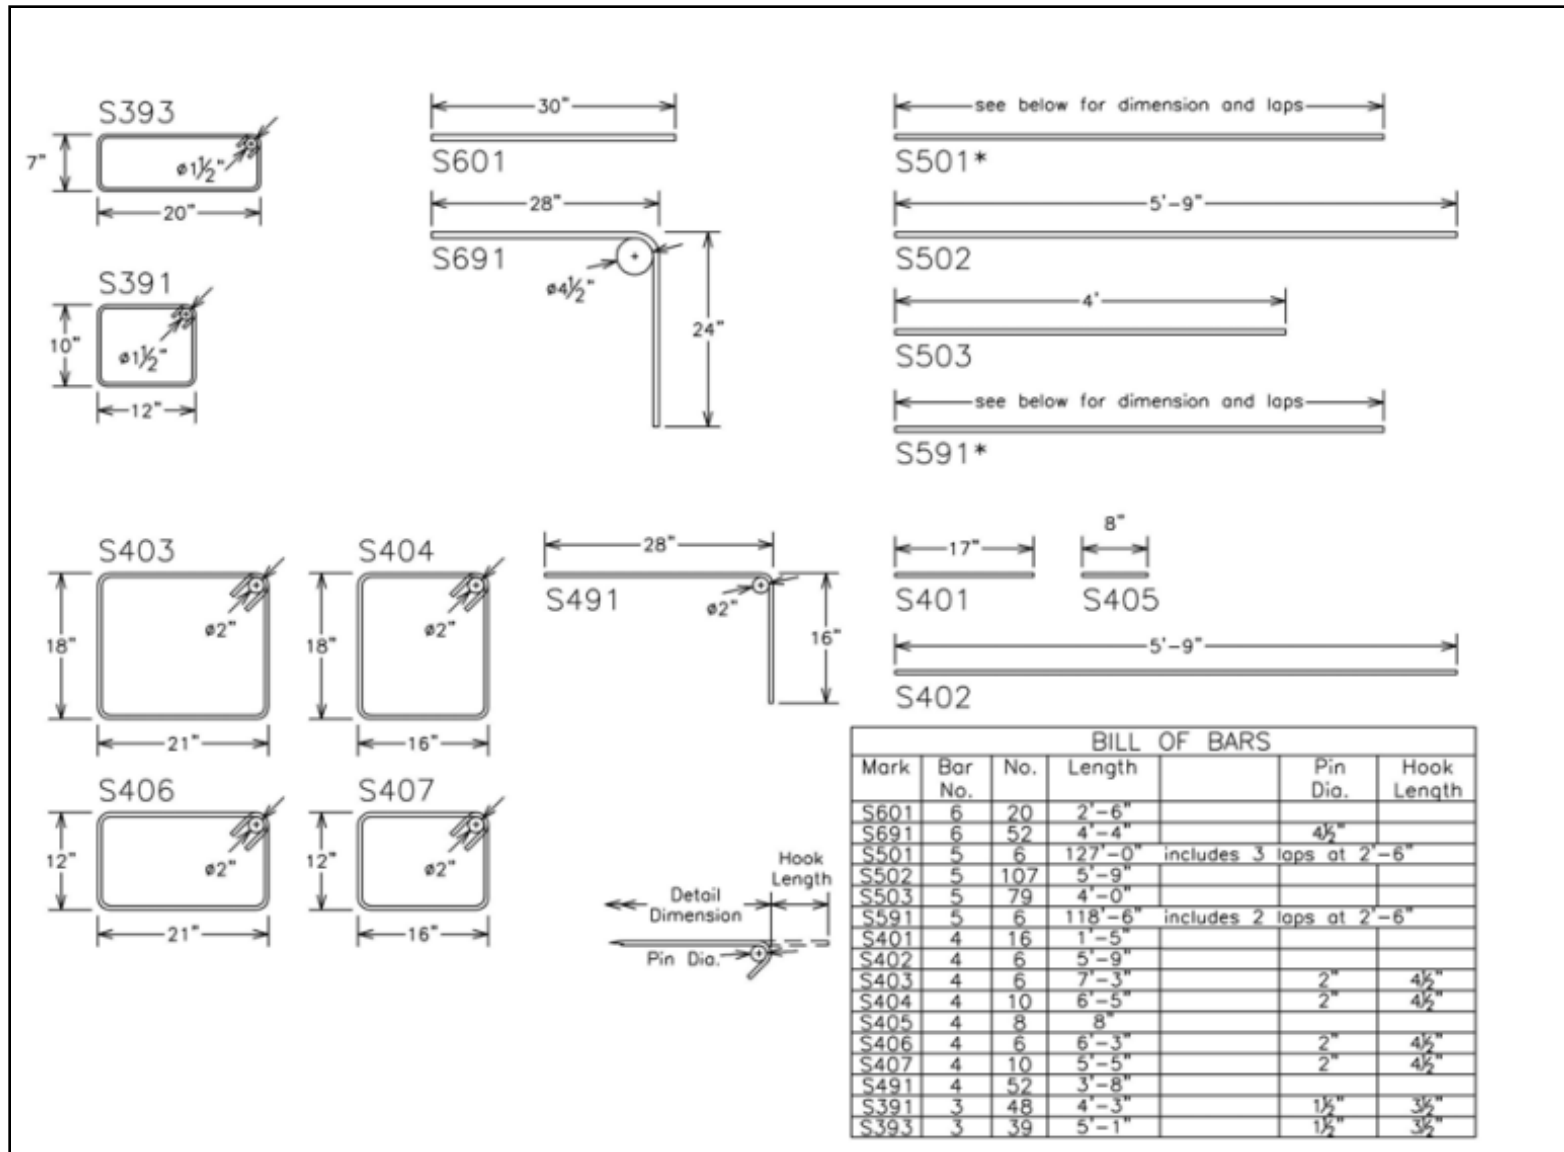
Bill of Bars for NDOT Open Concrete Bridge Rail [9]
